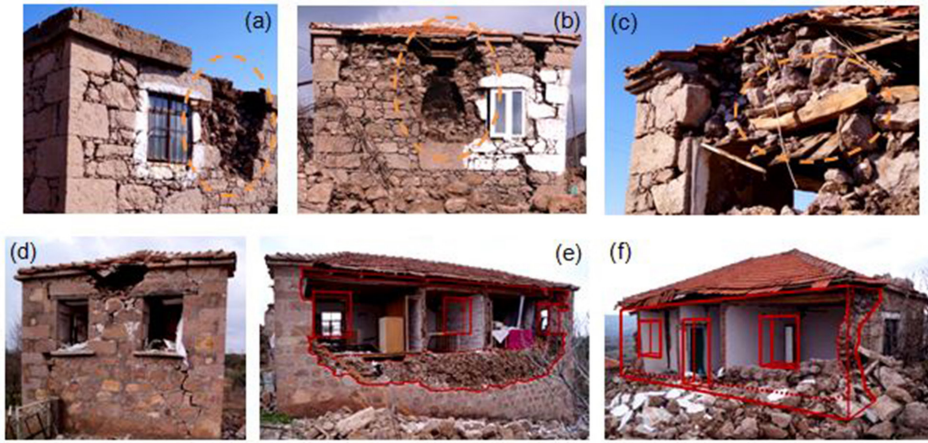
General damages of body of the external walls: partial collapse and disintegration (a,b,c), diagonal shear crack (d), and out-of-plane collapse (e, f).
